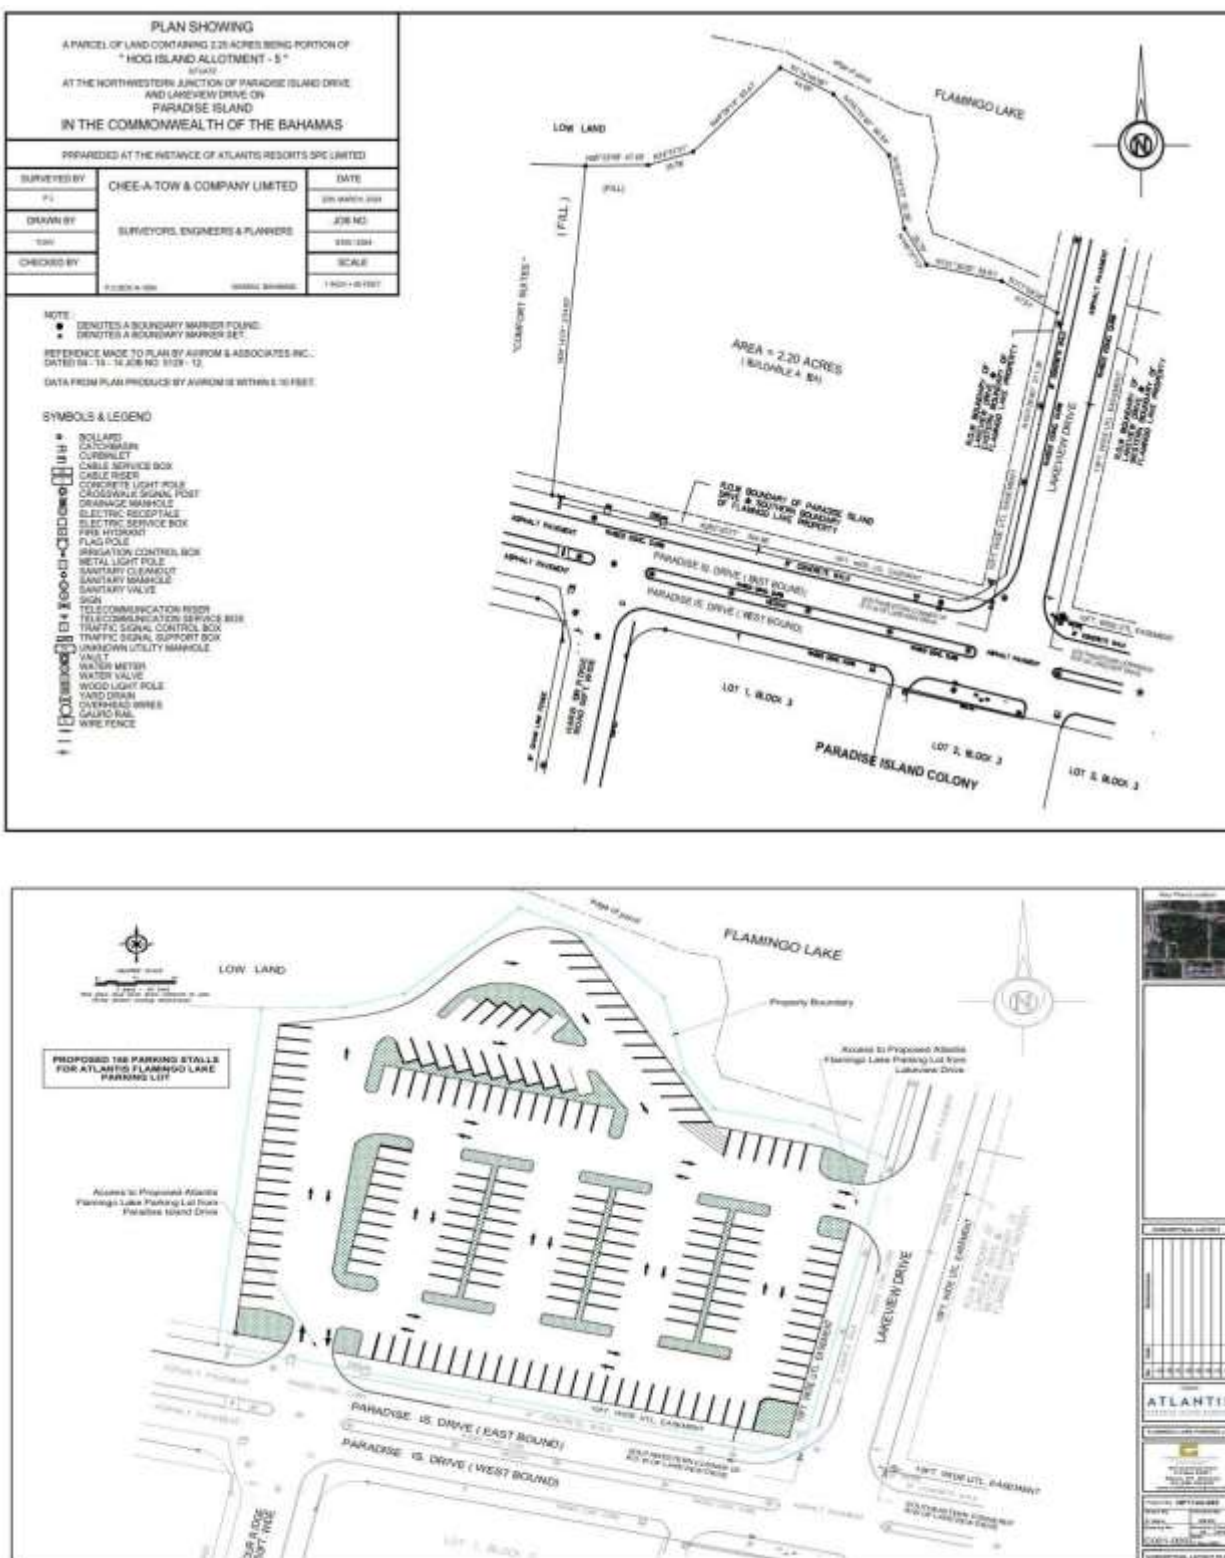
a & b: Survey Plans depicting old public parking boundary and layout of parking slots (2.2 acres)
